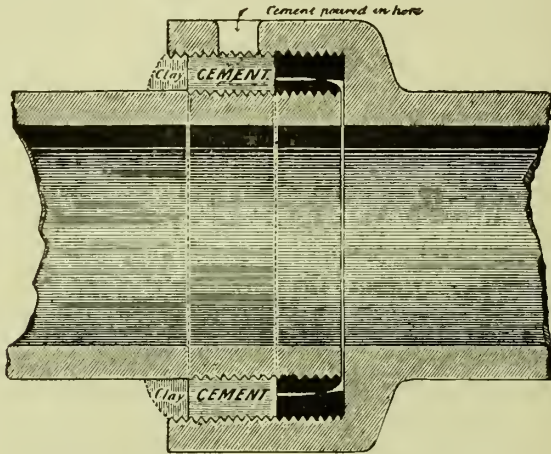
Hassall's Safety Pipe-joint, Single-lined.
